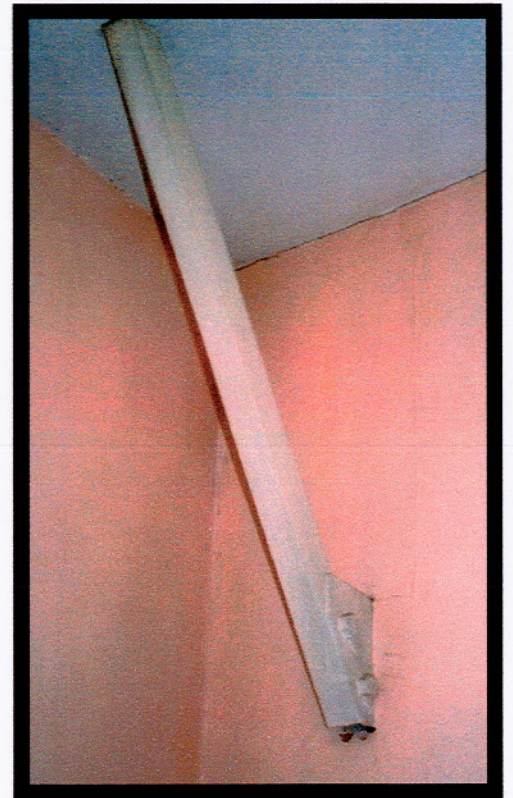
(right) - Accommodation block interior. Iron joist roof support. Photo 110/06
